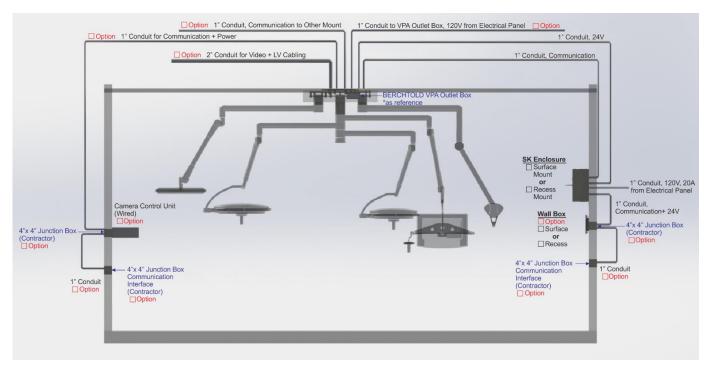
SK Enclosure (Shoulder Mount) Conduit Plan, Elevation View
